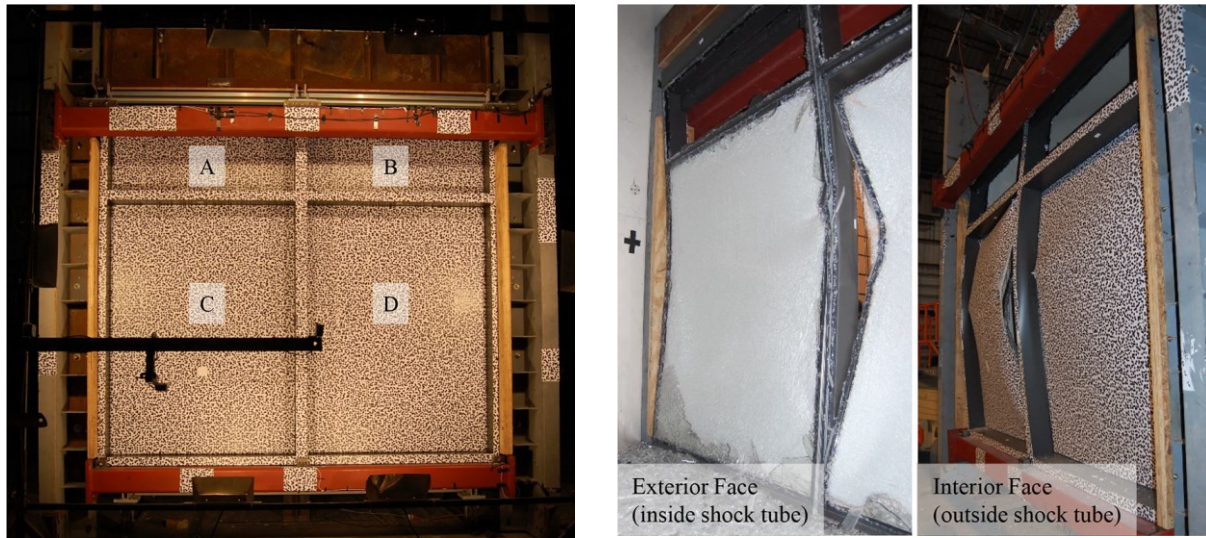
19 : Curtain wall specimen before (left) and after blast loading (right)
